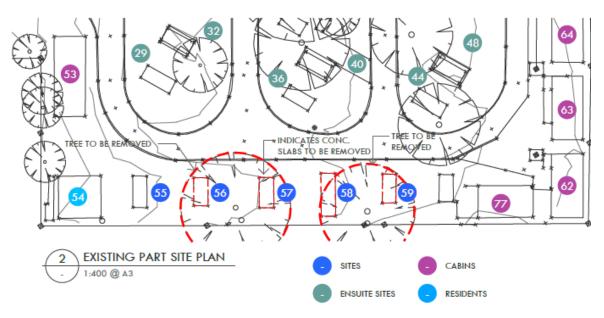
Demolition Plan/existing site plan, By Tasman Holiday Parks
